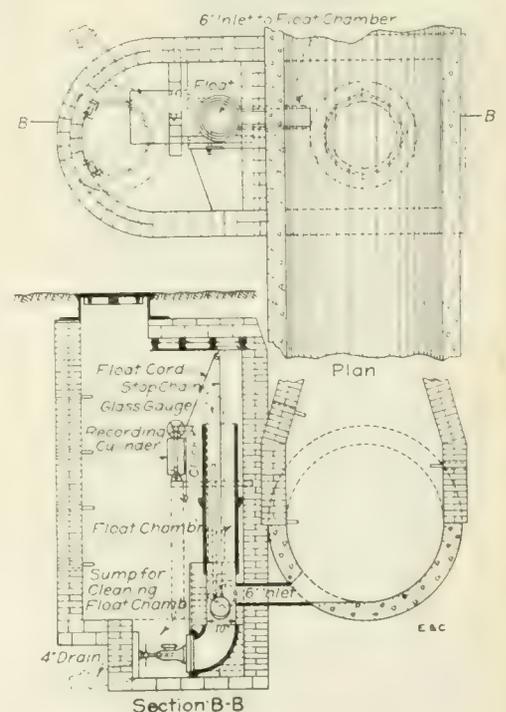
Plan and Vertical Section of the Gaging Manhole on the Ester Ave. Sewer, Pawtucket, R. I.
